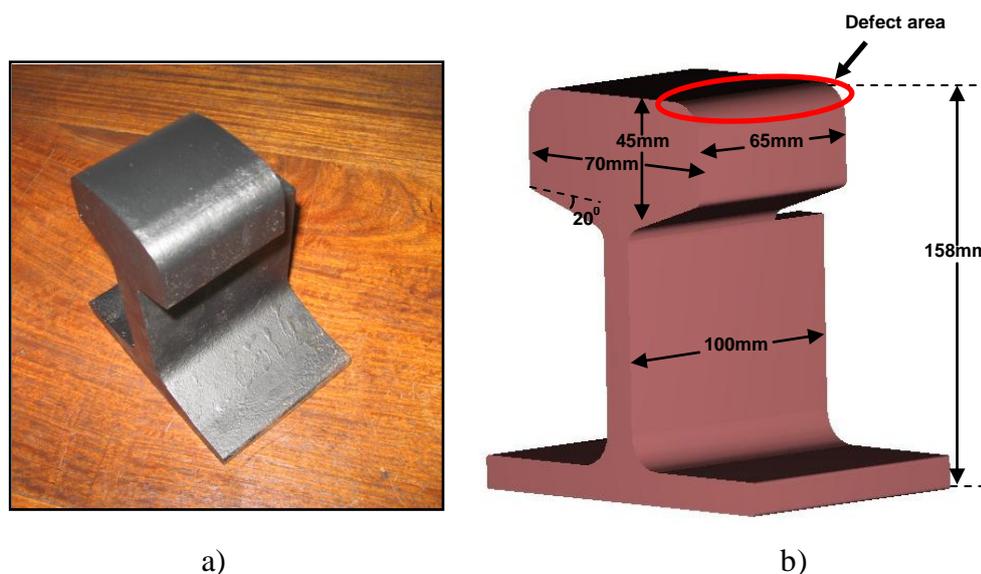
a) Rail head sample having cracks at the edges caused by RCF; and b) Schematic drawing of the rail head sample (drawing is not to scale)
